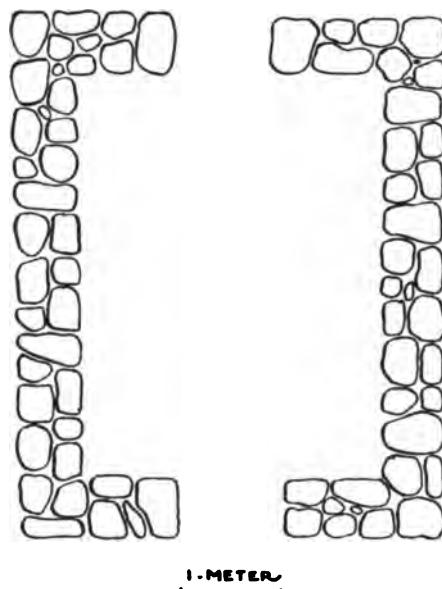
Plan of House Adjacent to Bone-Enclosures.
